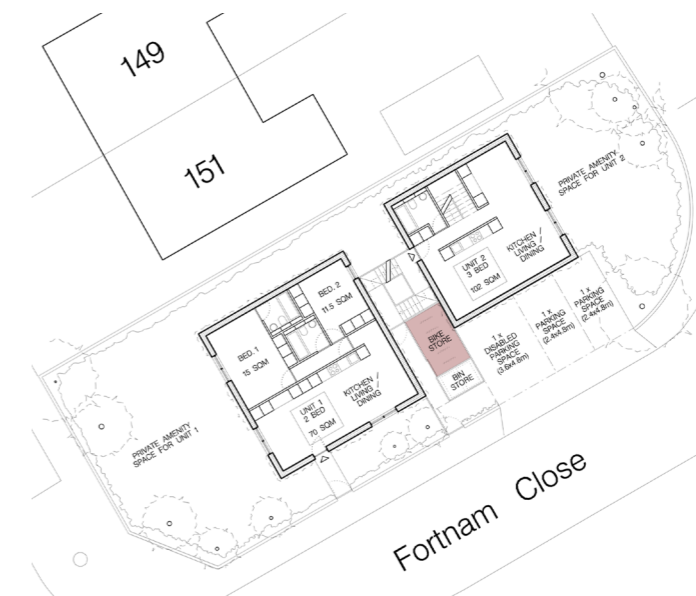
Proposed site plan showing secure and covered cycle parking area within close proximity to the entry to both building and road.
